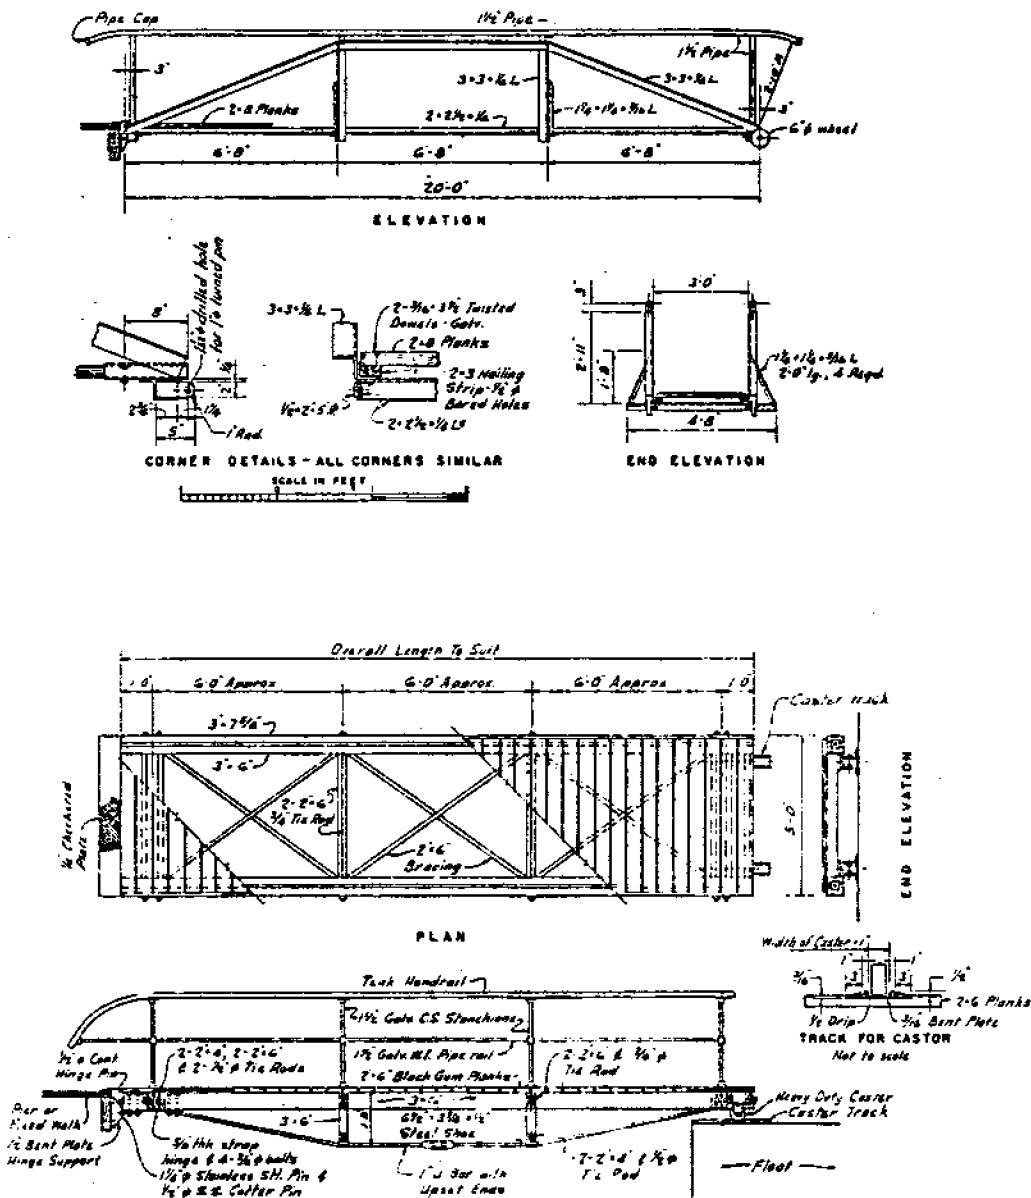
Truss Supported Gangways (Chaney, 1961, p. 143)
